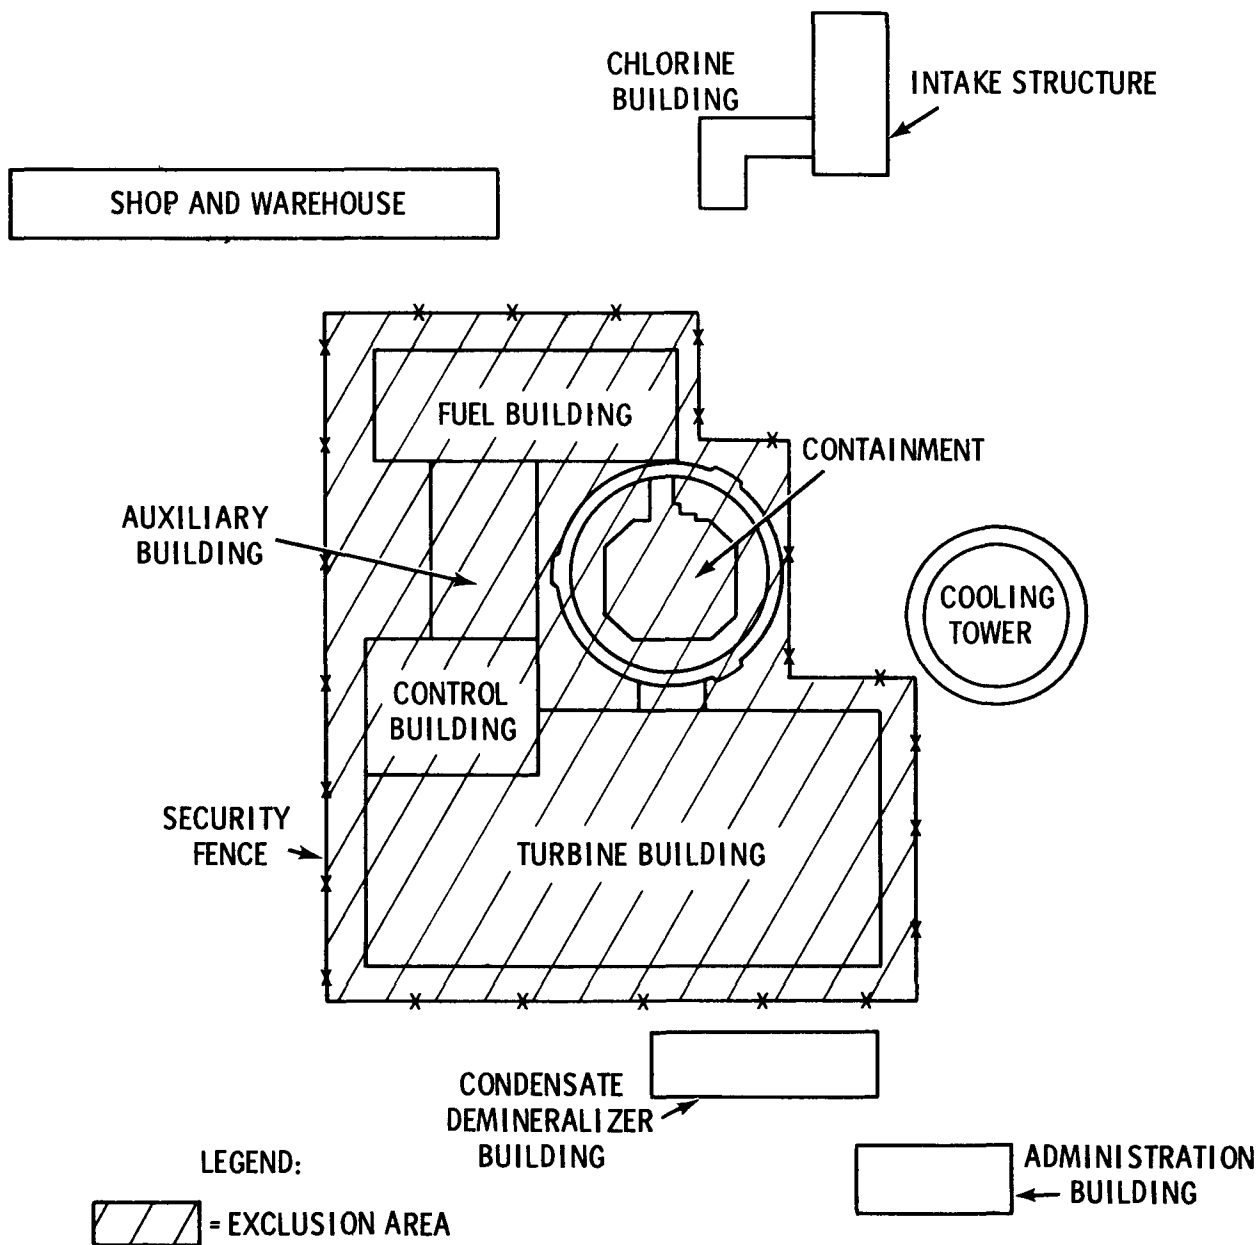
Plot Plan of the Exclusion Area and the Surrounding Area
